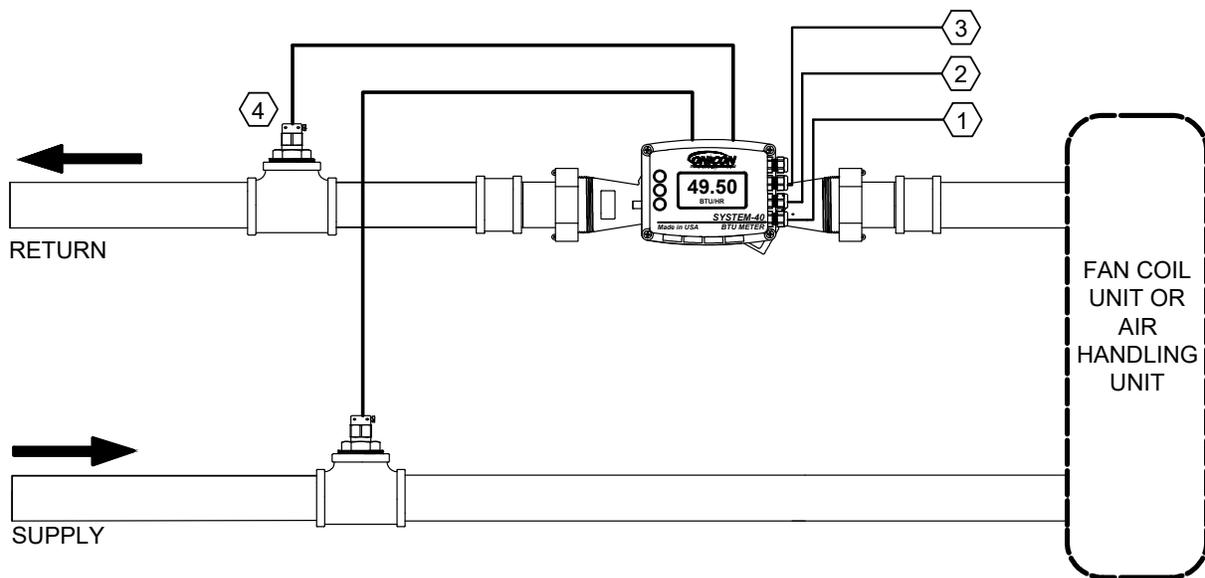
Installation Detail for Pipe Size Range from 1.25" - 2.5"
